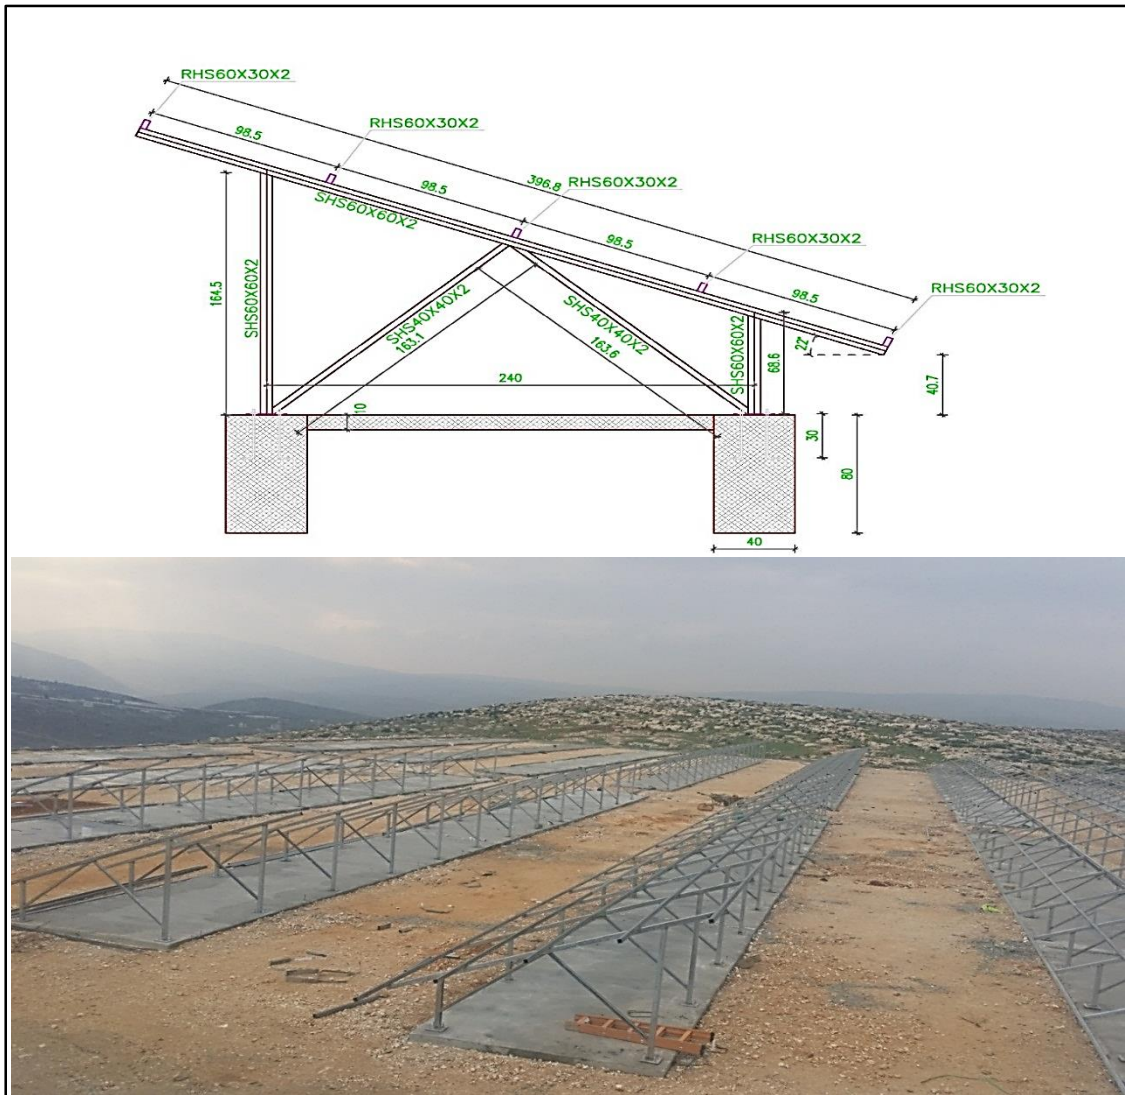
Frame Details and Trusses before PV Modules Fixing
